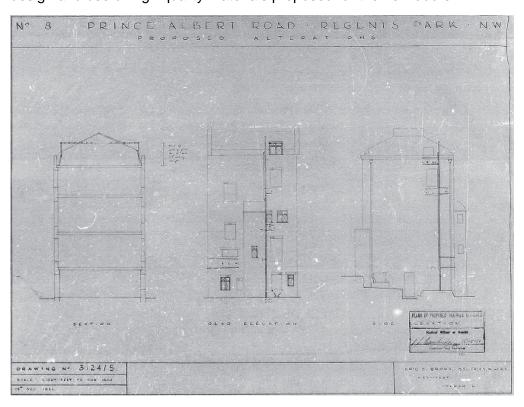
(above): Approved 1956 drainage elevations (Source: Camden Archives).
